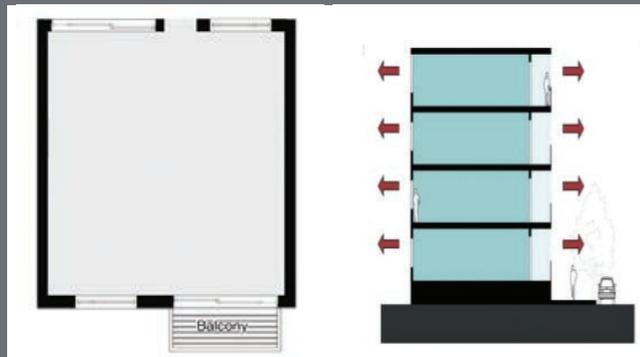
Elevation plan for a dual aspect one bedroom flat
